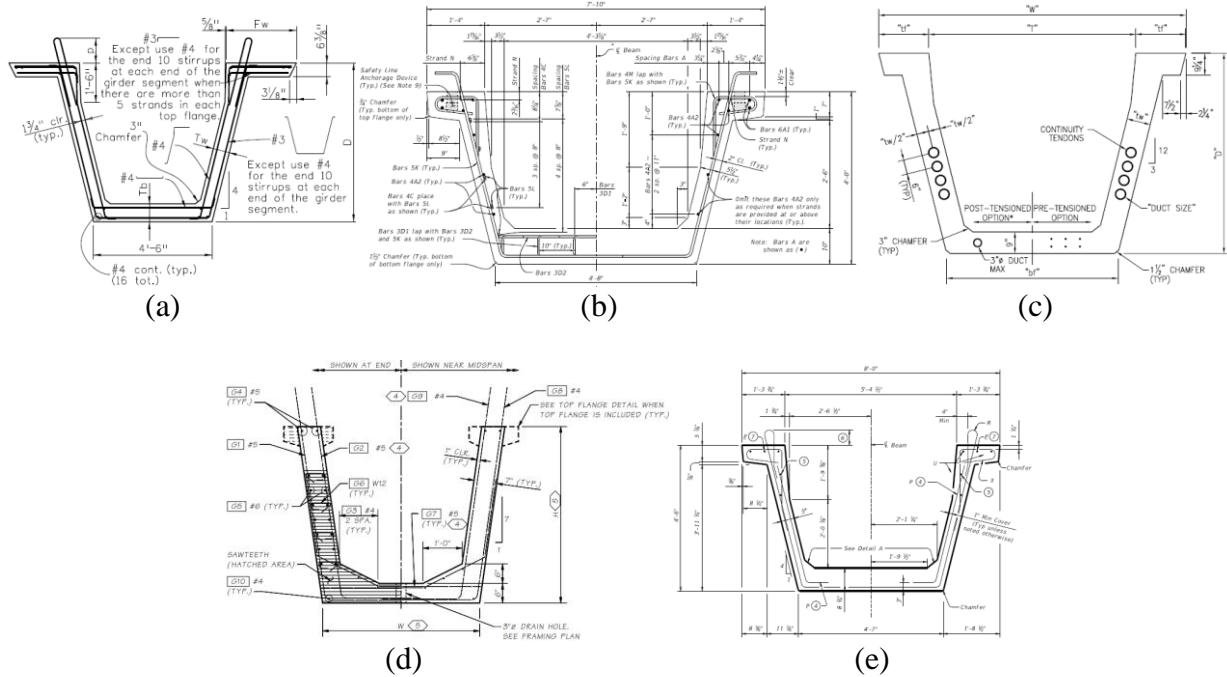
Prestressed concrete tub girders: (a) Colorado; (b) Florida; (c) PCI; (d) Washington; (e) Texas
